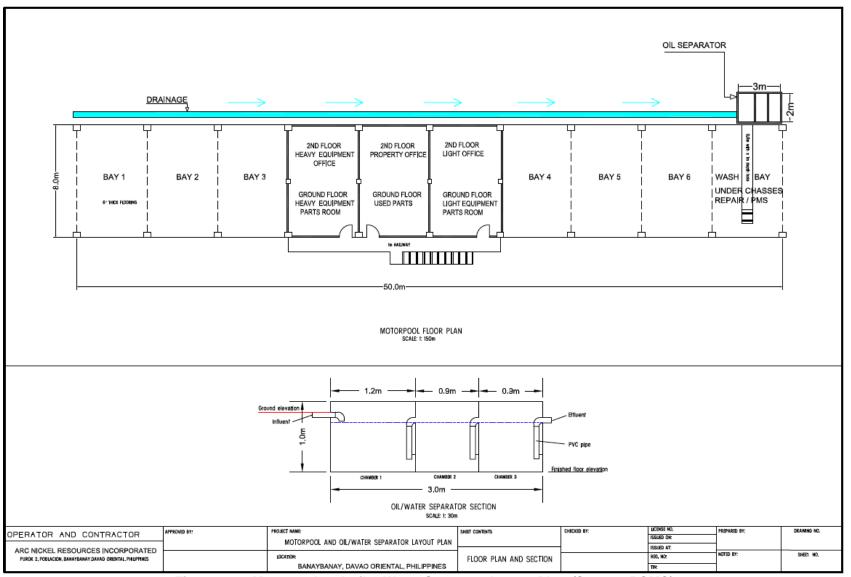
Motorpool and Oil & Water Separator Layout Plan (Source: RCMC)
